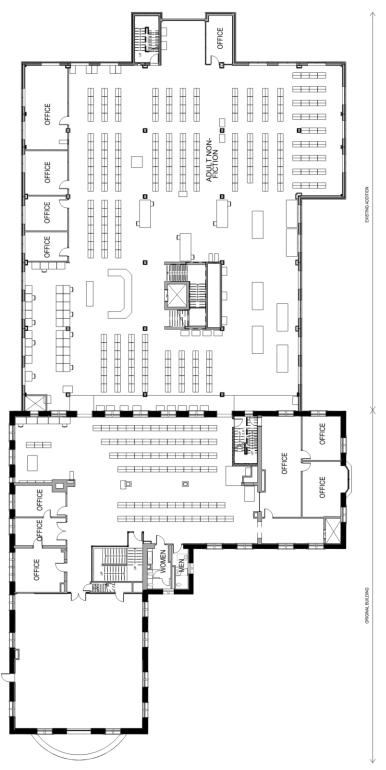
Second floor sketch floor plan, not to scale. (JLK Architects 2025)
